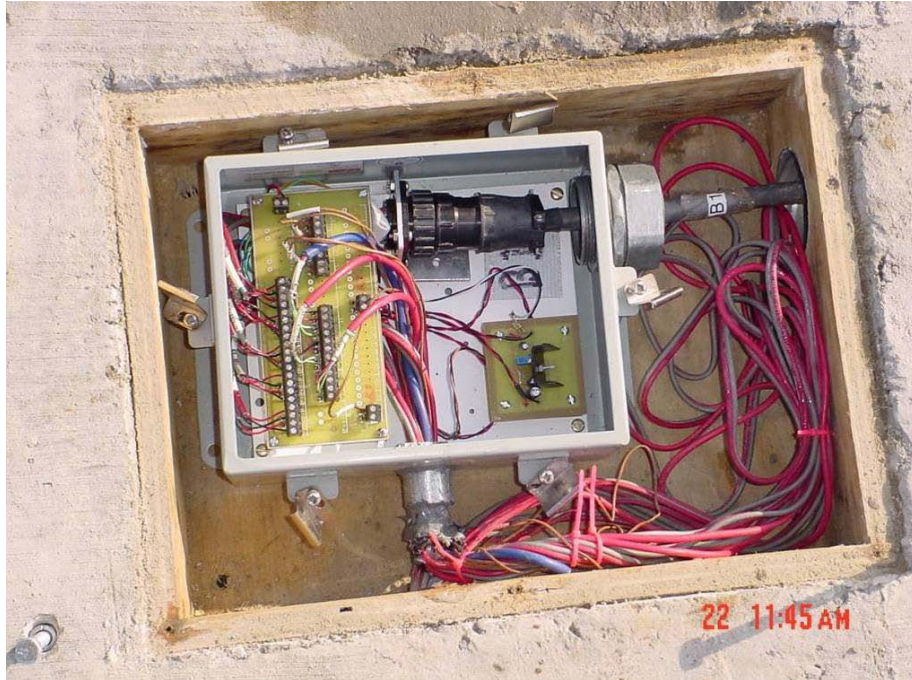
Junction box installed in blockout cast in outside shoulder of precast pavement panels
